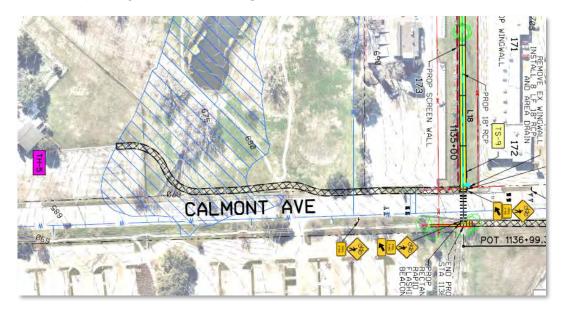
Future Connection to Z Boaz Park Parking Lot
